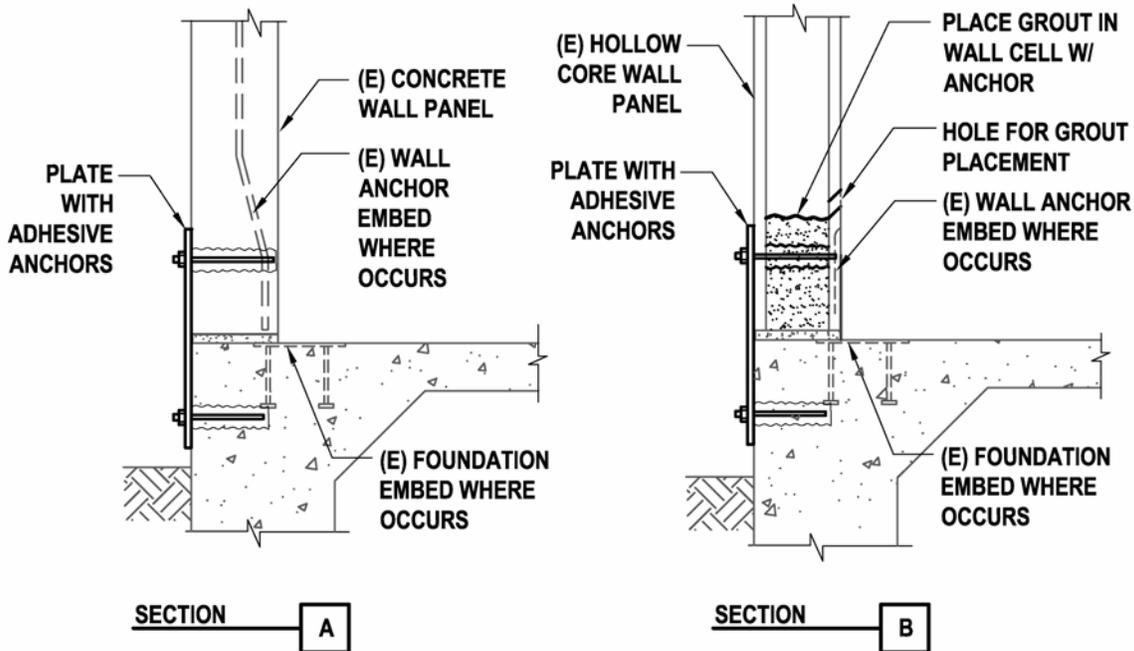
Added or Enhanced Precast Wall-to-Foundation Connection
